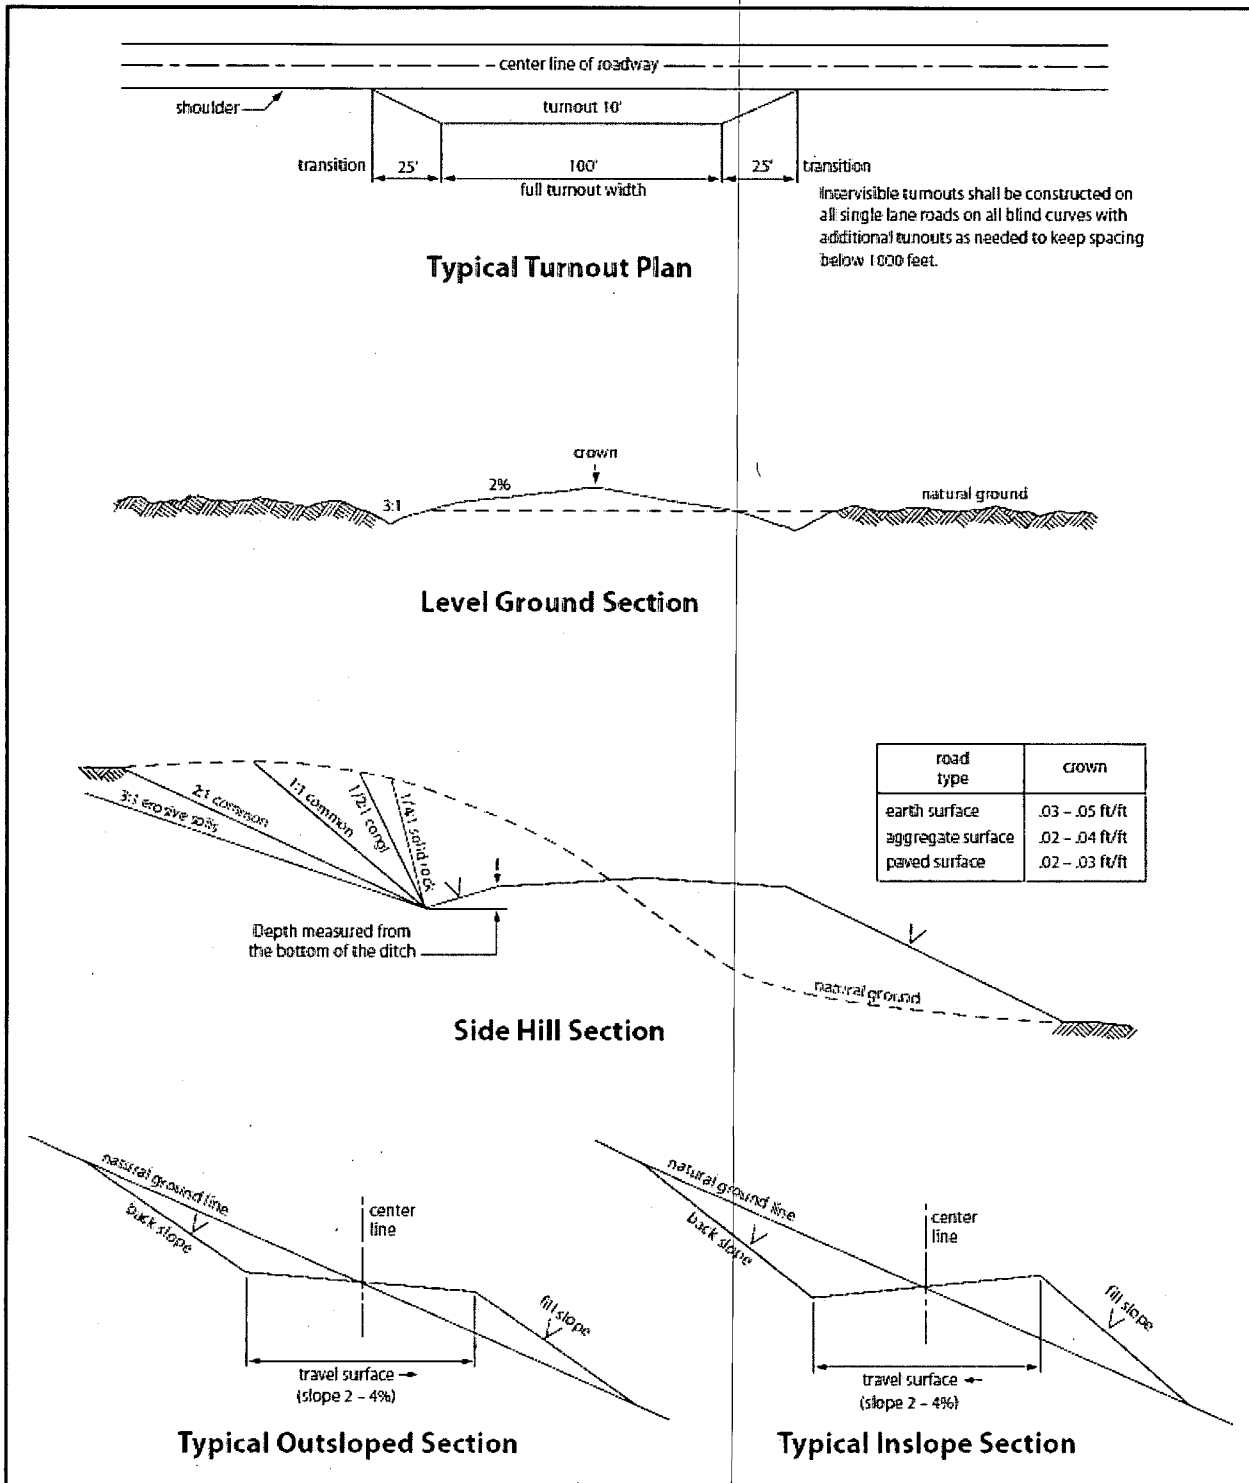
Cross-sections and plans for typical road sections representative of BLM resource or FS local and higher-class roads.
